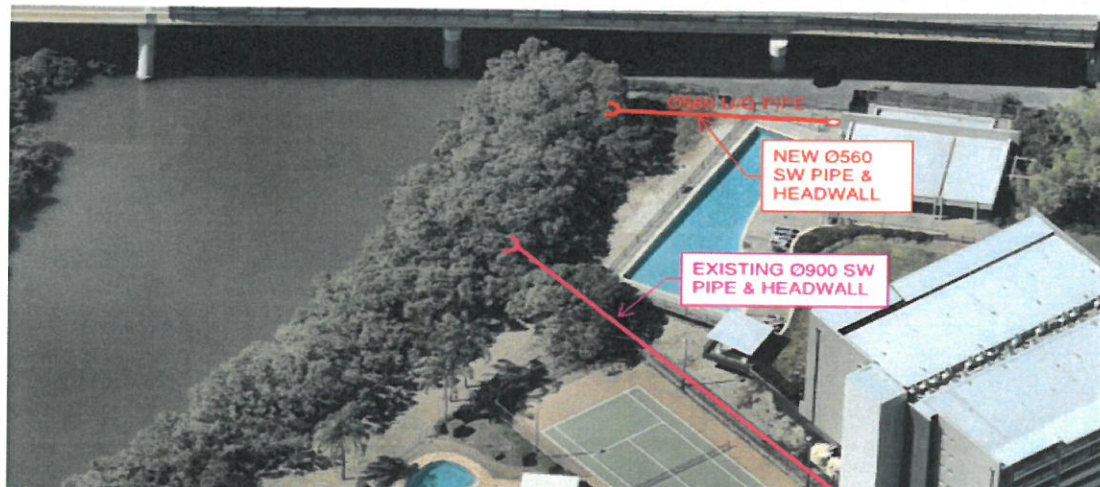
LOCATION OF NEW CREEK SW DISCHARGE POINT
